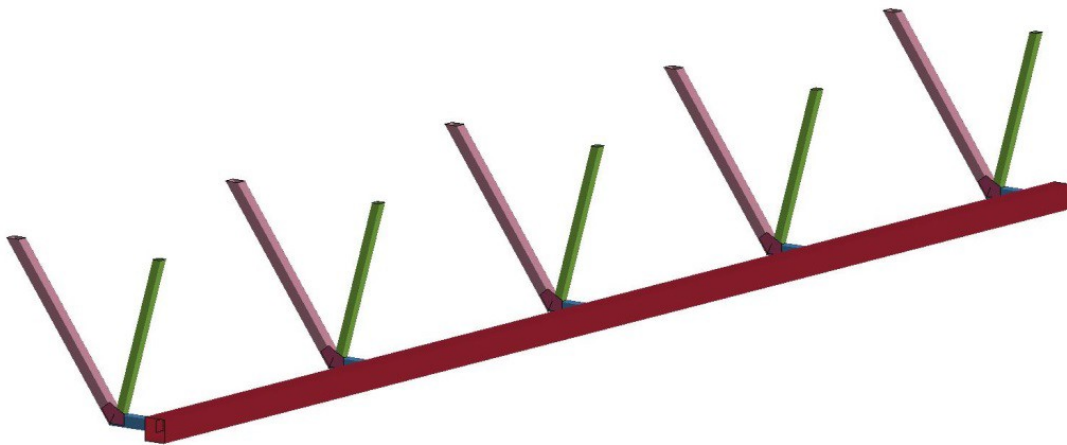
Layout of stiffened tubular steel braces within SUPD system
